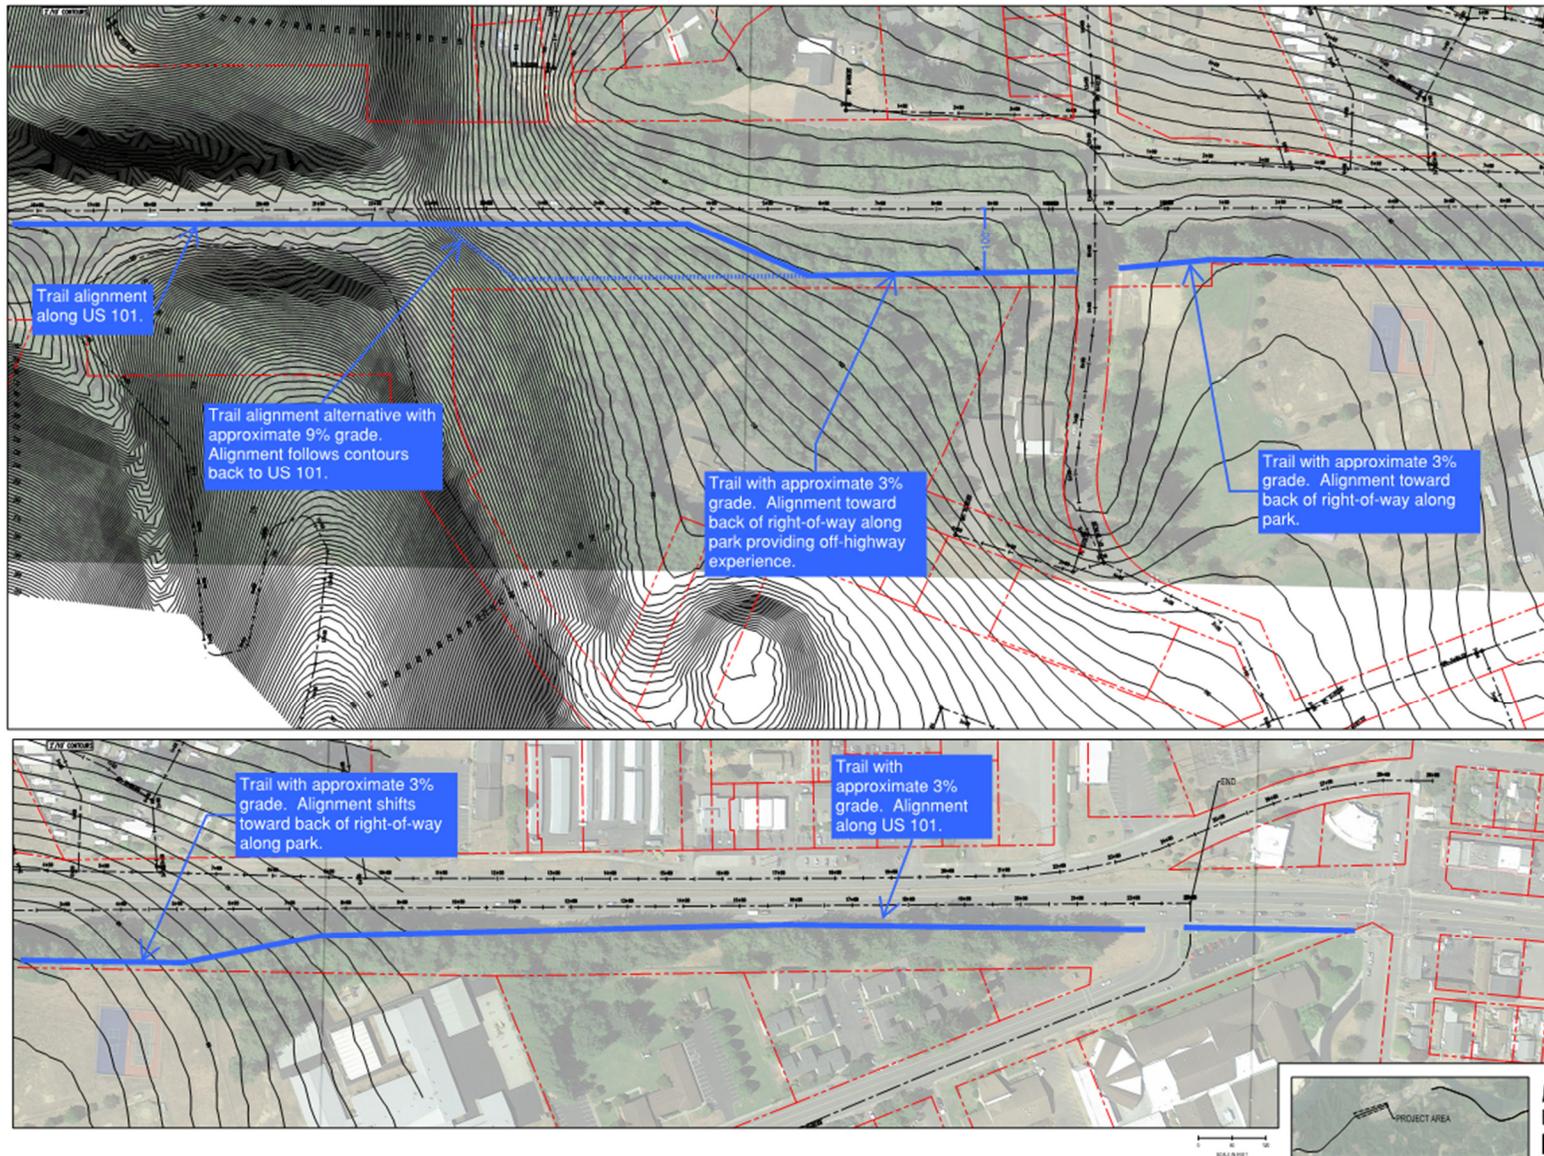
DDT West Segment, 2<sup>nd</sup> Street to Reedsport West Road
